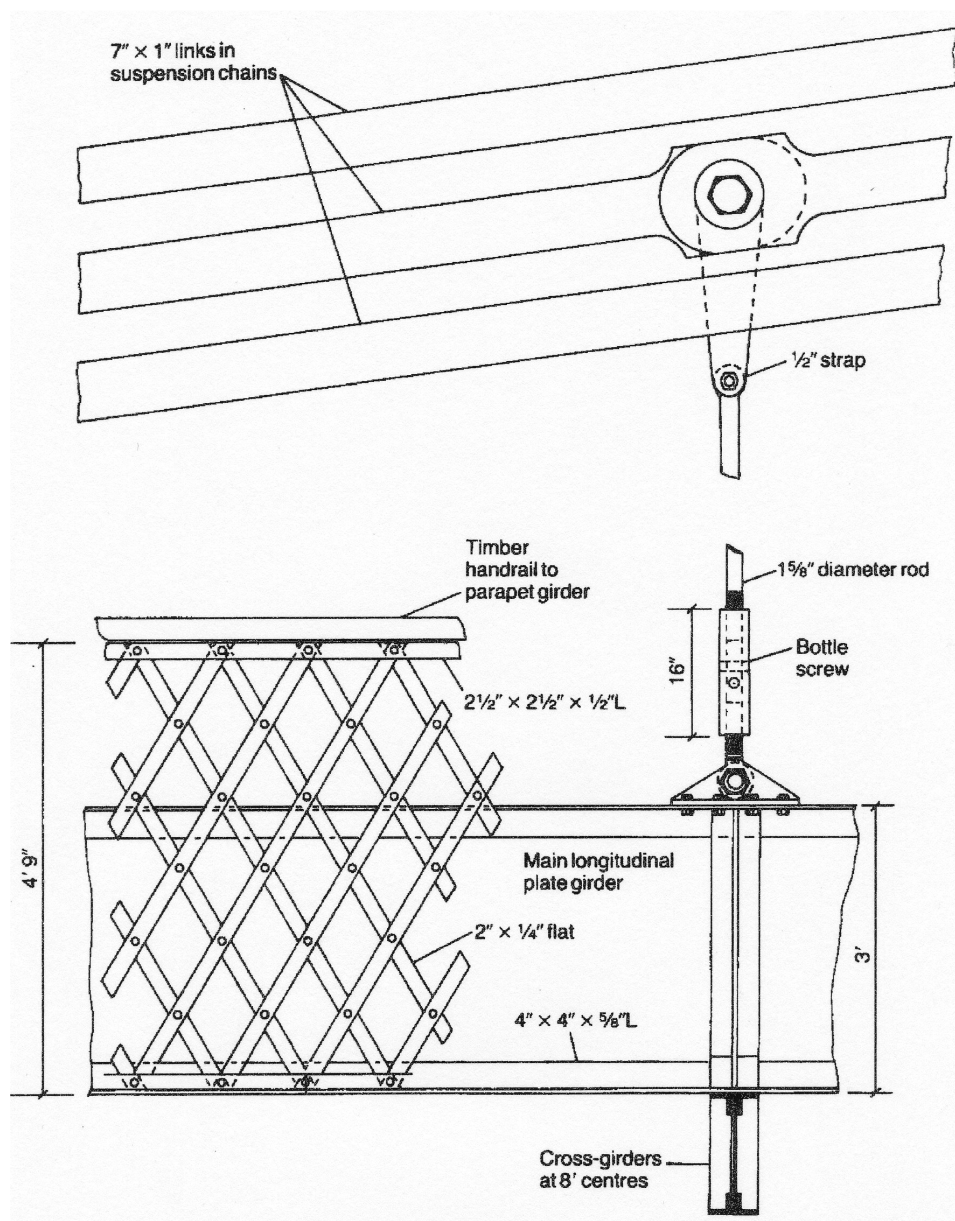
side elevation of chains, hanger rod, stiffening girder and parapet girder (Mitchell-Baker1988)
